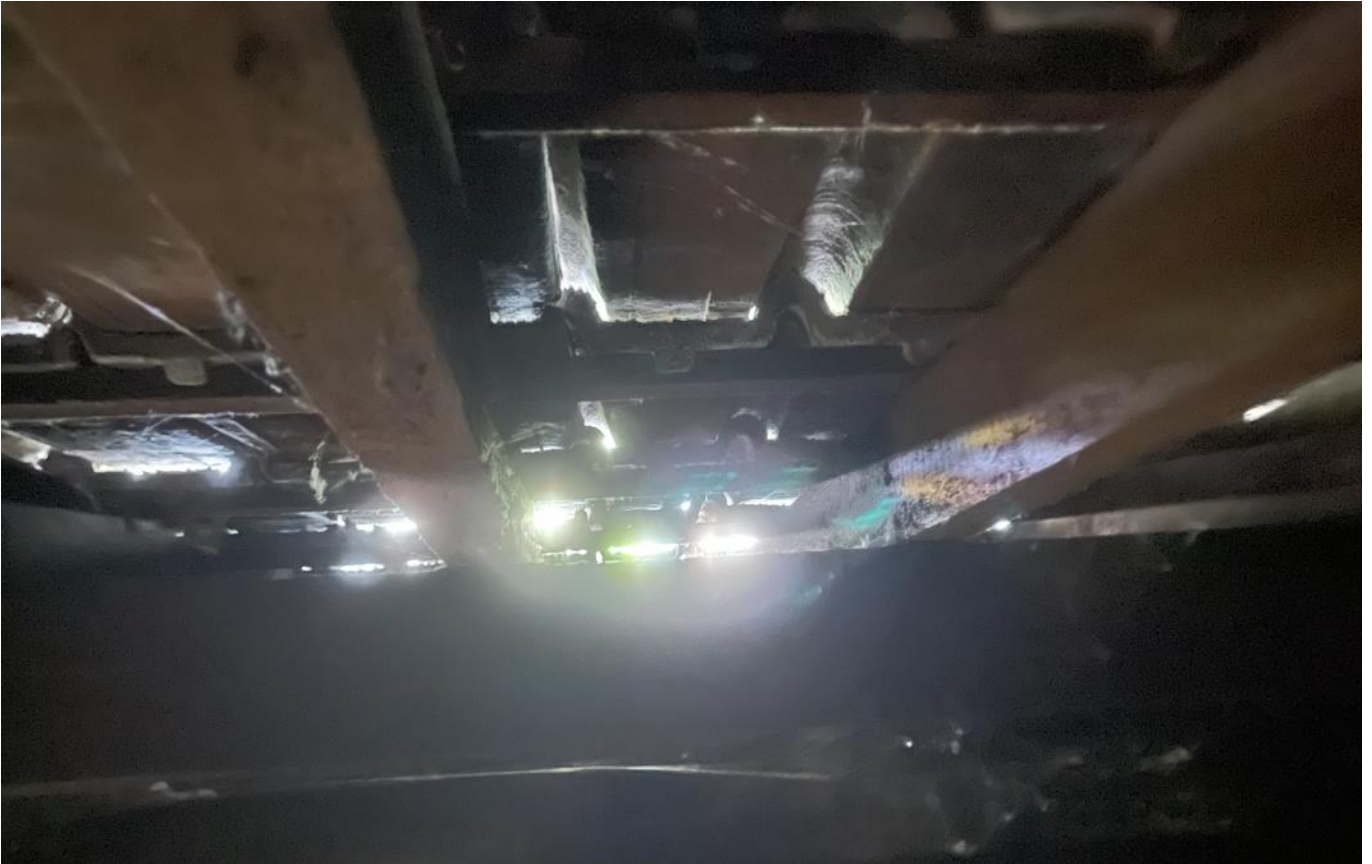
Example of light / environmental entry to the roof void via lifted/gaps below tiles.
